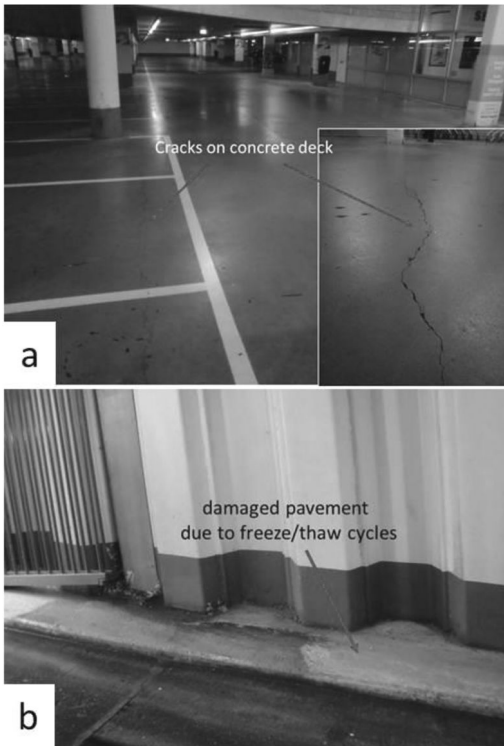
Test location for the application of the bacteria-based repair system. (a) cracks on the concrete deck, (b) pavement on the side of the access ramp.
